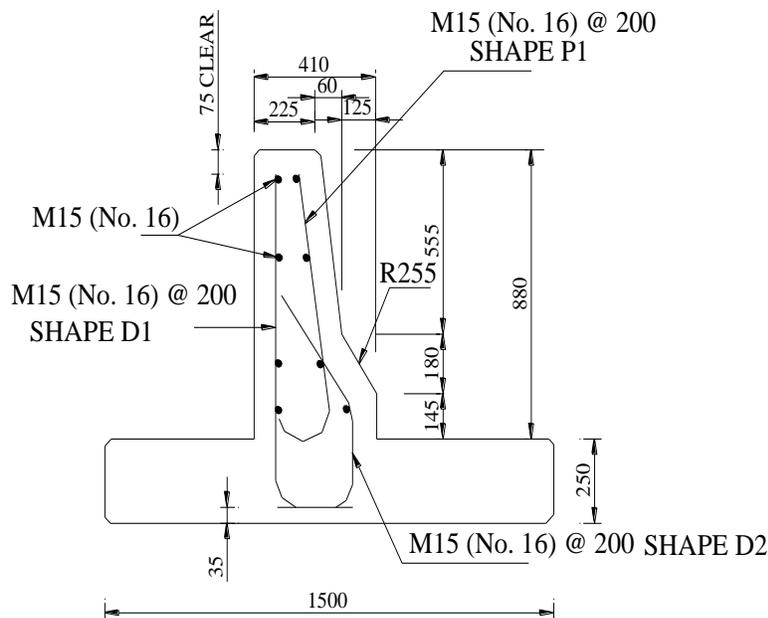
Reinforcement detailing of PL-2 barrier (El-Salakawy et al. 2004)
